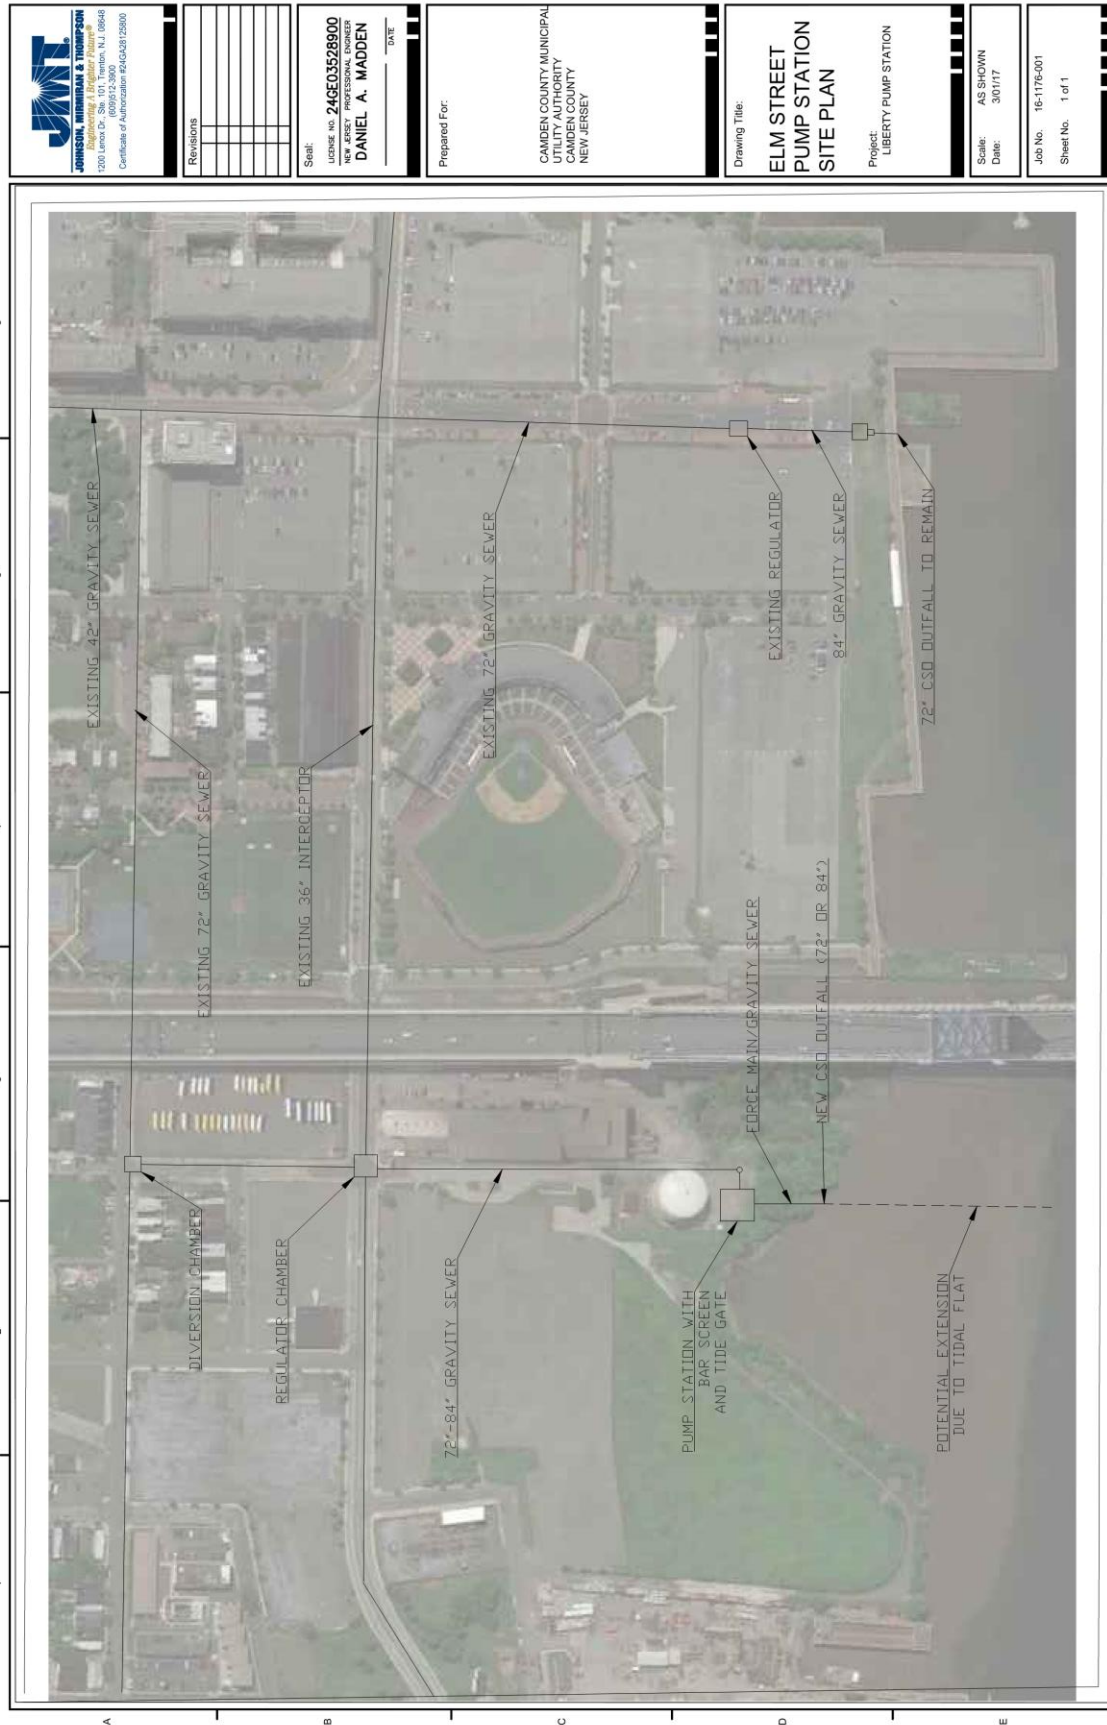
Elm Street Stormwater Pump Station Site Plan
